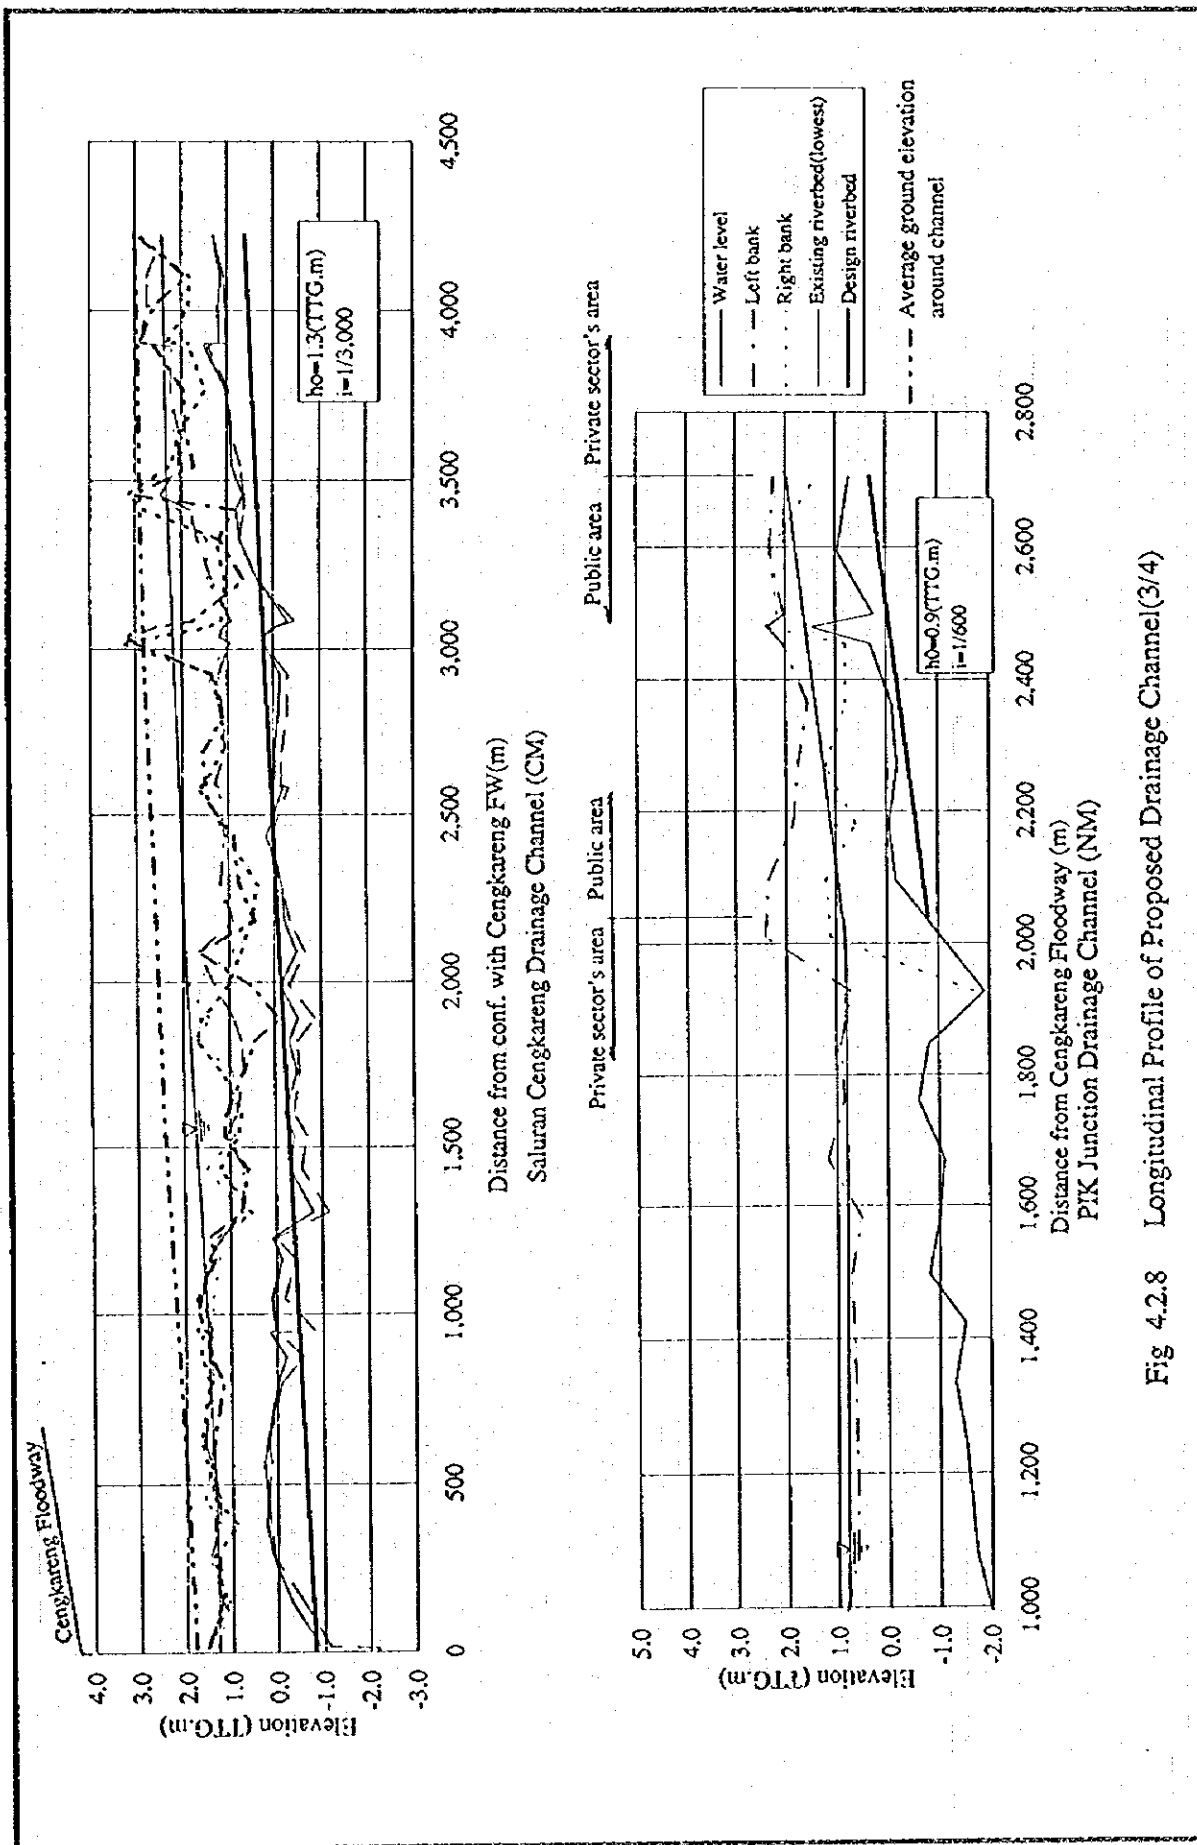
Longitudinal Profile of Proposed Drainage Channel(3/4)
